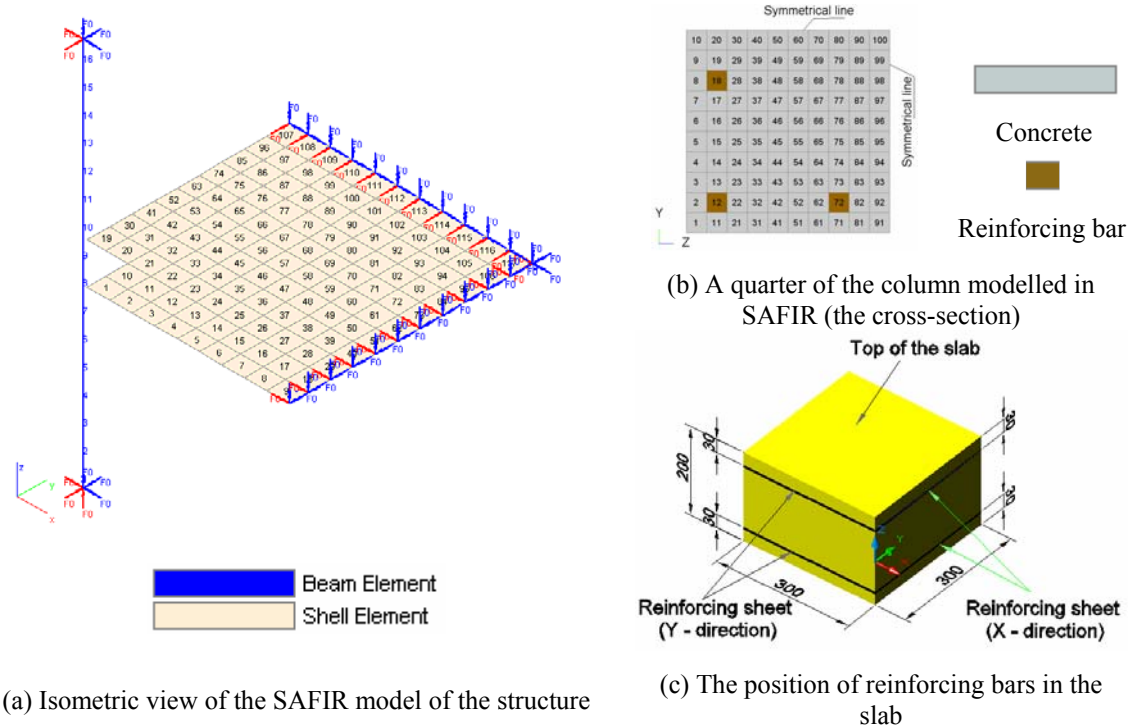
The SAFIR structural model of the one-bay flat slab with a column on the corner
